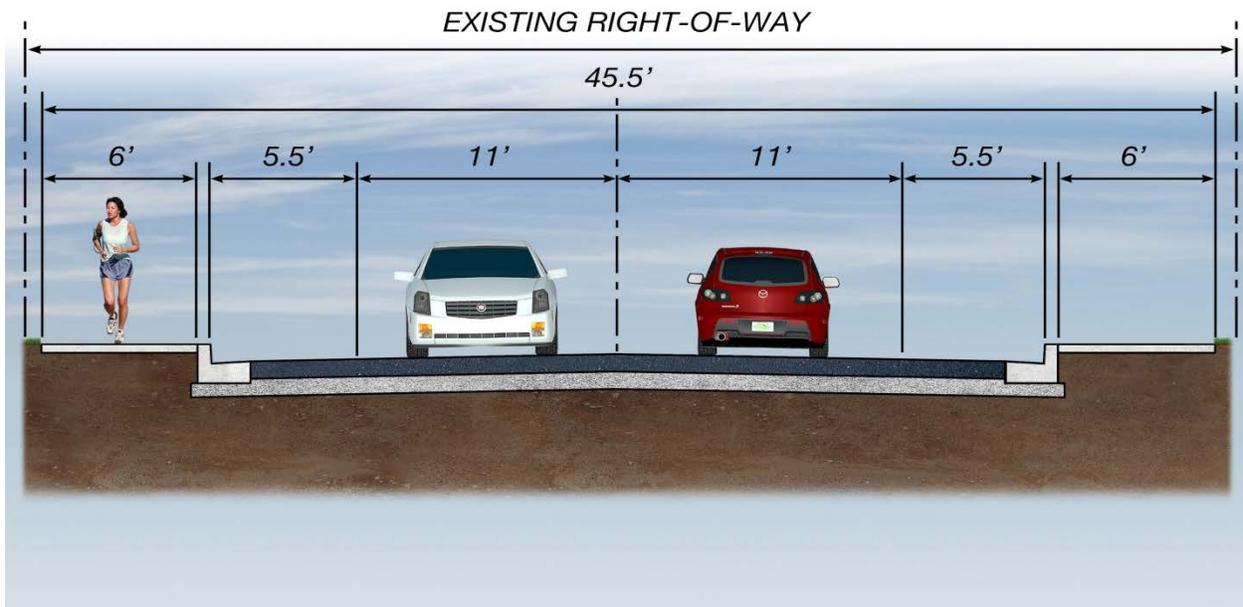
Proposed Roadway Section East of Proposed Movable Bridge
